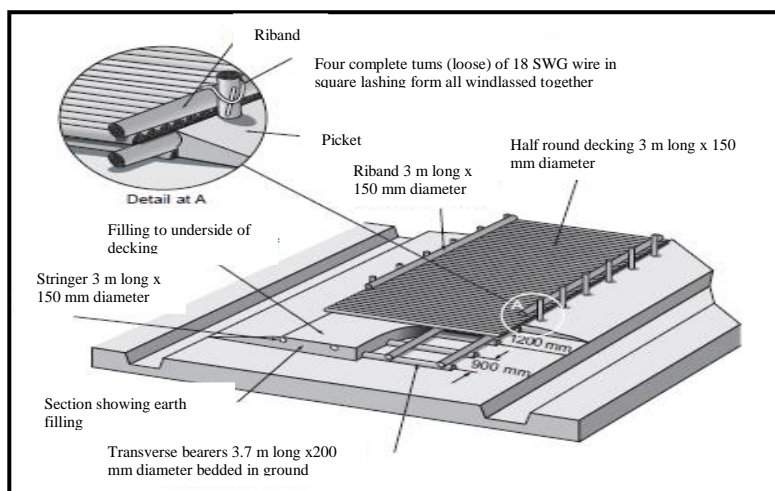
Three-Metre Corduroy Road (Diagrammatic)
